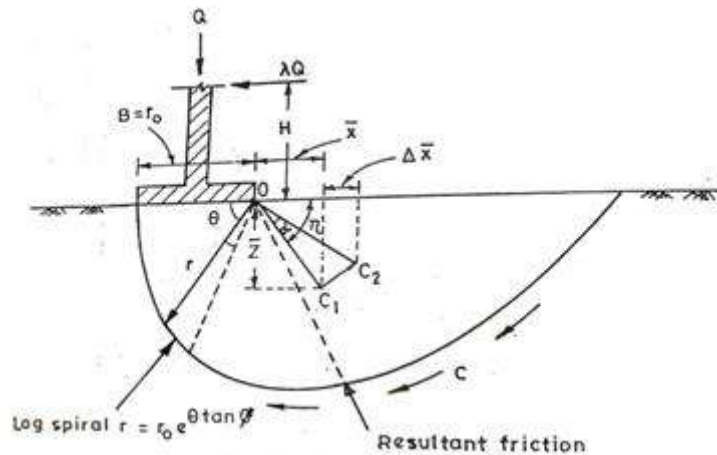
Transient horizontal load on a continuous strip footing resting on ground surface
